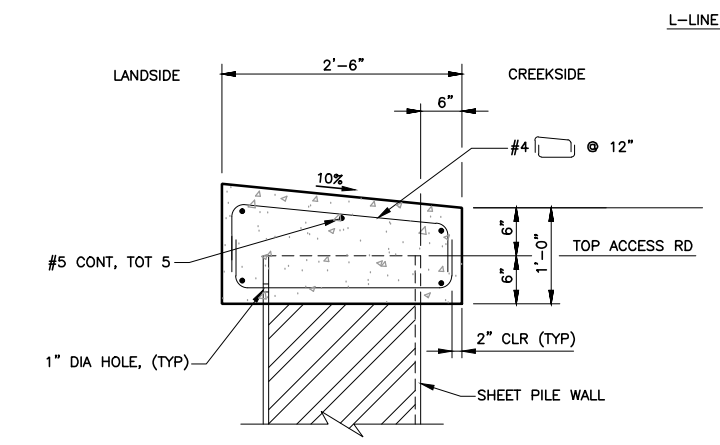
END SHEET PILE FLOODWALL AT CALTRANS BRIDGE
